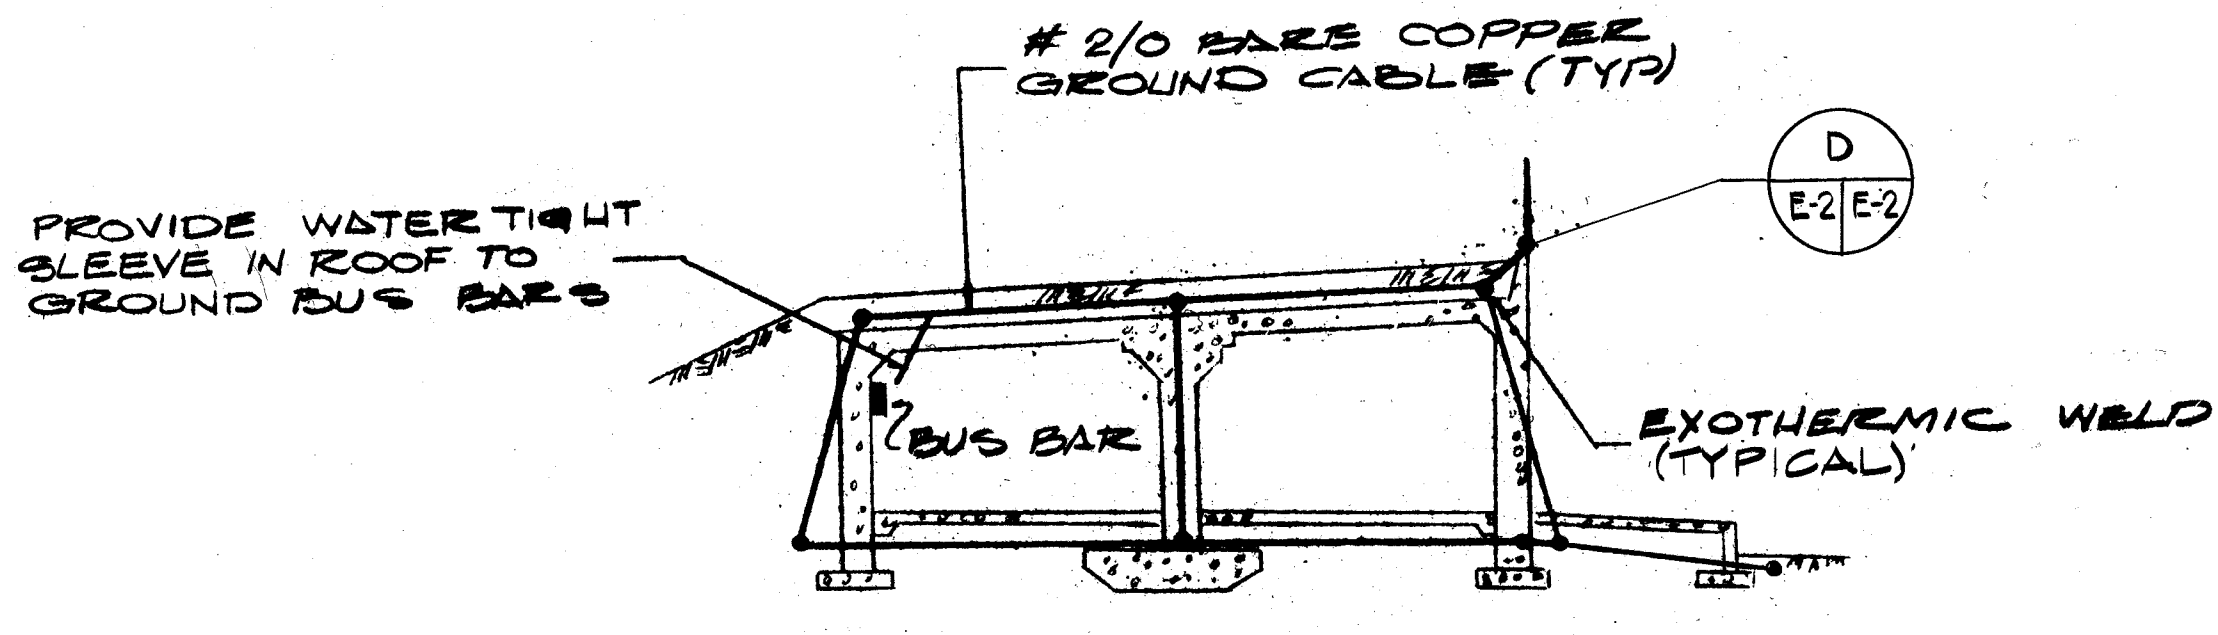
DETAIL - GROUND ROD INSTALLATION IN EARTH FILL C
